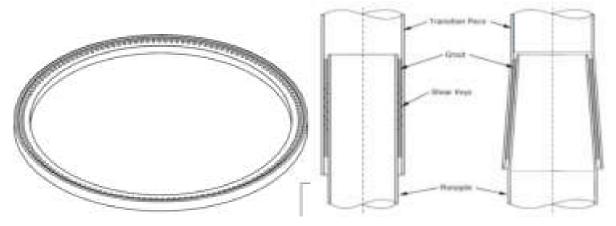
Connection types: bolted flange connection (left) and grouted connections (right) [L18]
